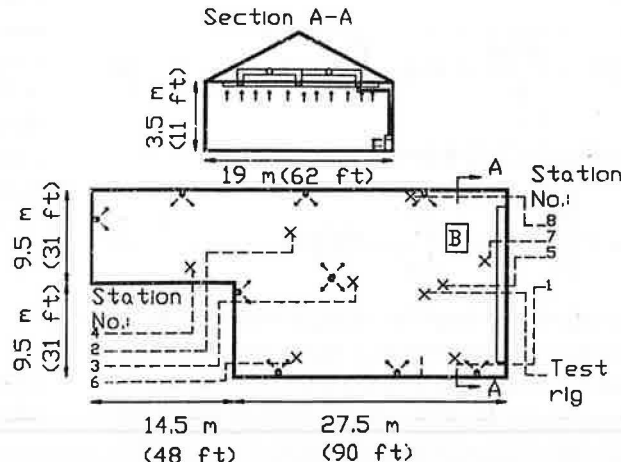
Layout and cross-section of the plant designed for DISPVENT (not to scale)
